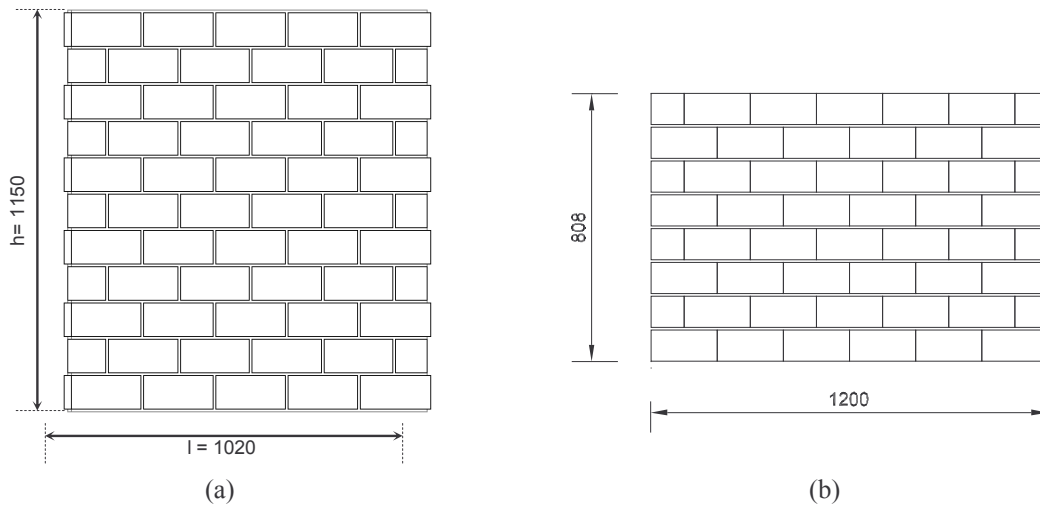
Geometry of the tested walls; (a) lightweight concrete masonry walls; (b) reinforced concrete masonry walls (dimensions in mm)
